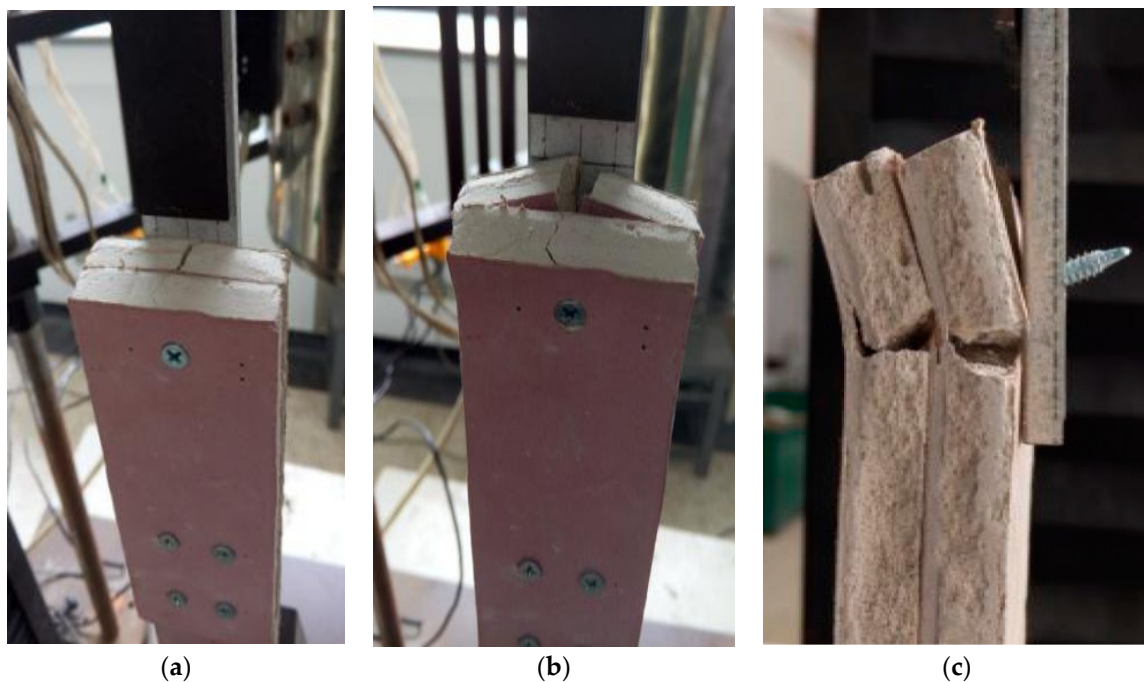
The failure process of GPB20D-20: (a) cracking of the base layer gypsum plasterboard on the loaded edge; (b) failure of the base layer gypsum plasterboard; and (c) B + T + F failure.
